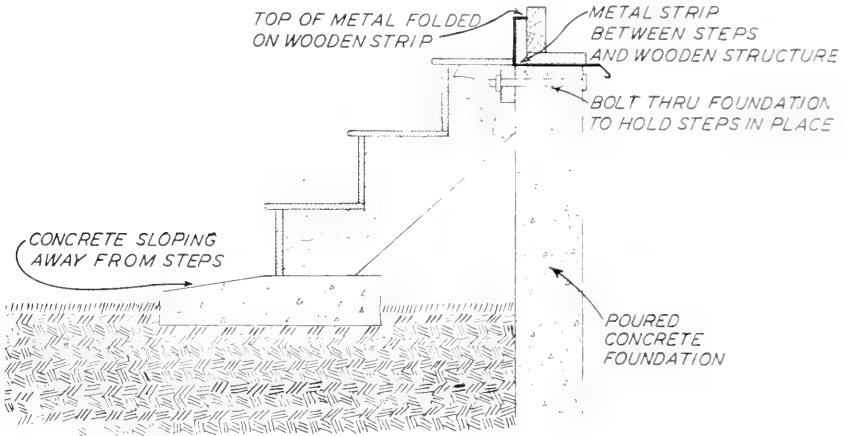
A satisfactory method of installing wood steps to minimize the danger from termite attack.
